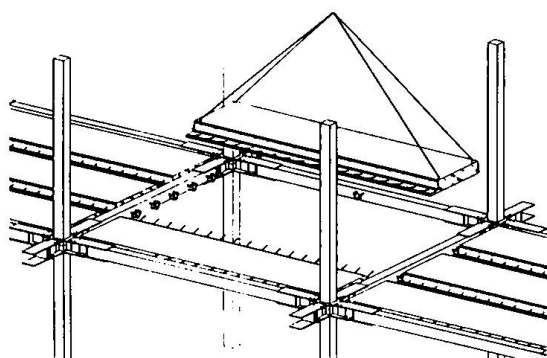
A composite structure with steel MRF and RC prefabricated slabs.
